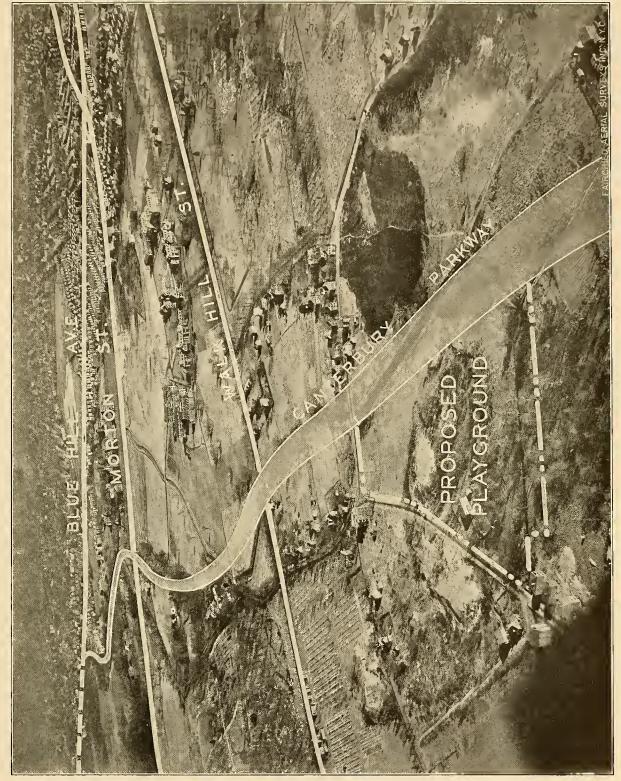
NORTH PORTION OF CANTERBURY PARKWAY SHOWING MORTON STREET, STATE HOSPITAL LANDS AND WALK HILL STREET.
